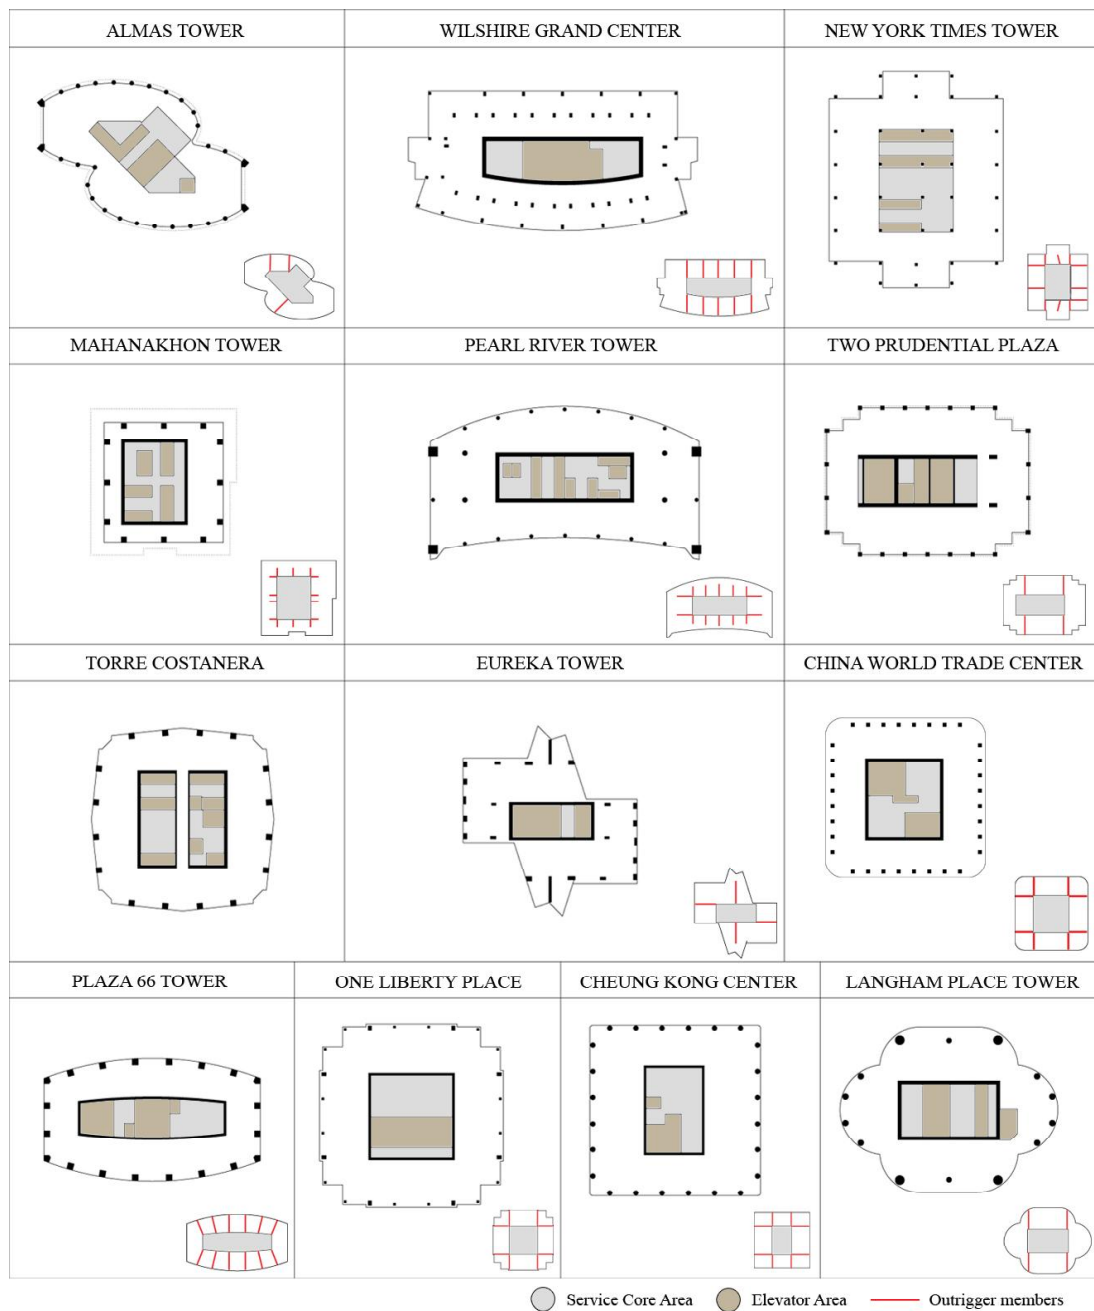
outriggered frame buildings, schematic plans (top left) and outrigger application (bottom right)
